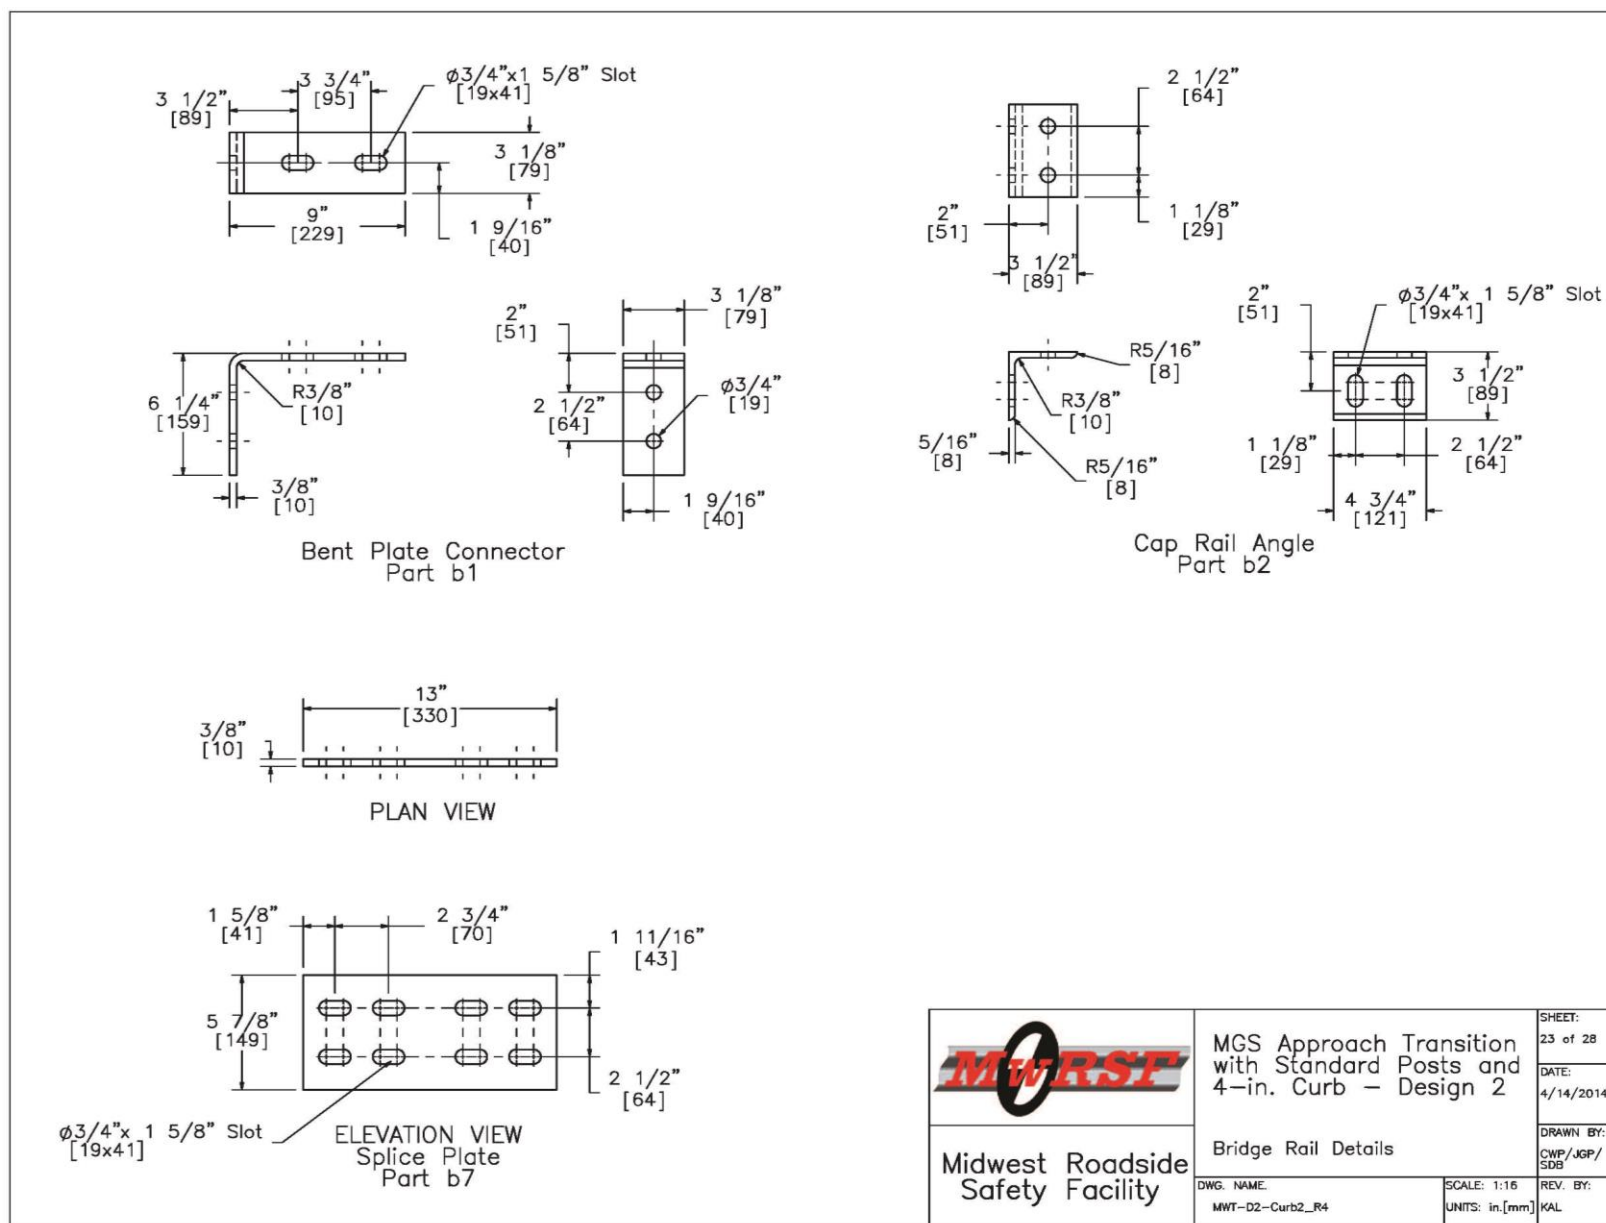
Bridge Rail Details, Test Nos. MWTC-2 and MWTC-3
